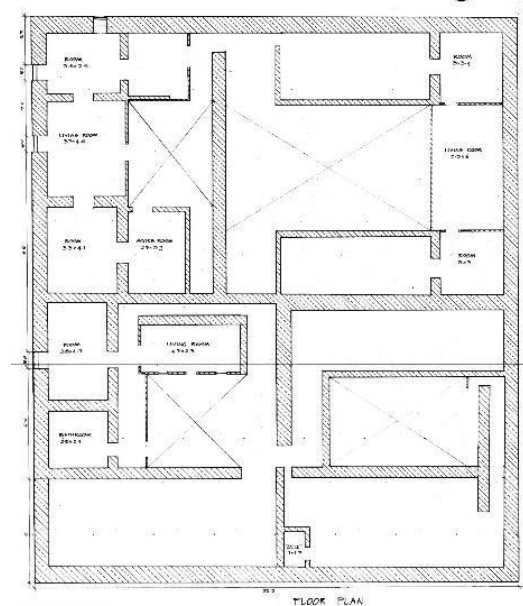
case 3 – Mansabdar house first floor plan (Source: Author)
